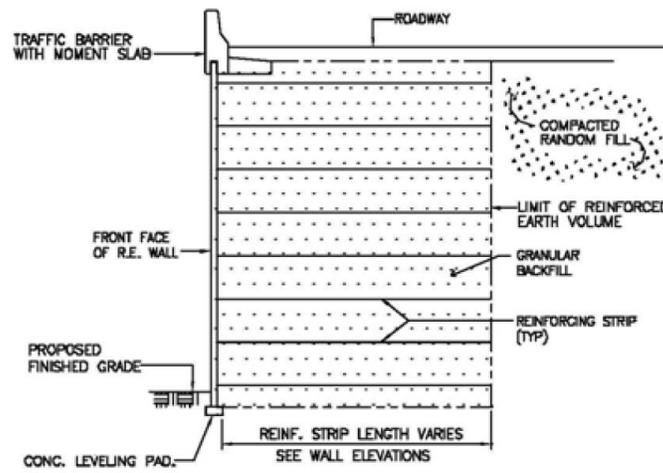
Typical Mechanically Stabilized Earth Systems (MSE) Wall Details [1]
